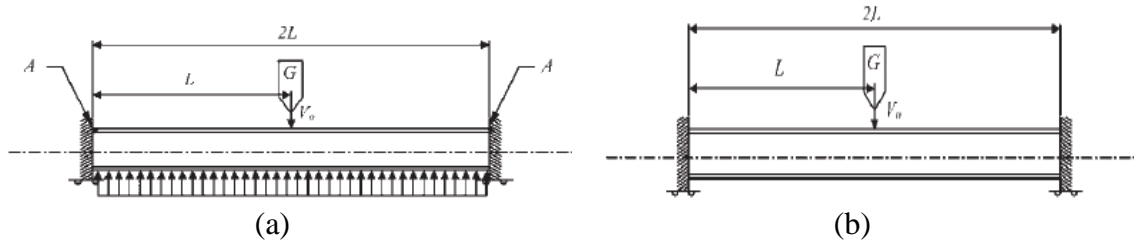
Layout of pipe specimens (a) laid on sand or kaolin soil layer or (b) suspended [Ng & Shen (2006)].
